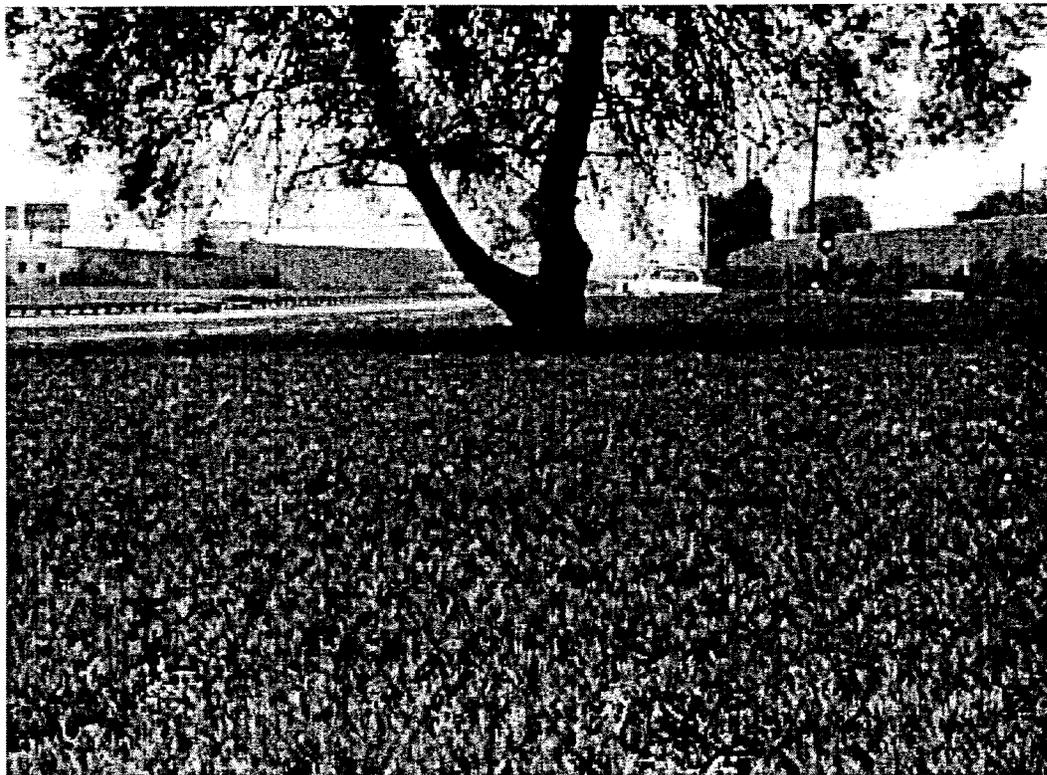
710/Florence Interchange, Section 710-3-f. Photo taken looking southeast.
